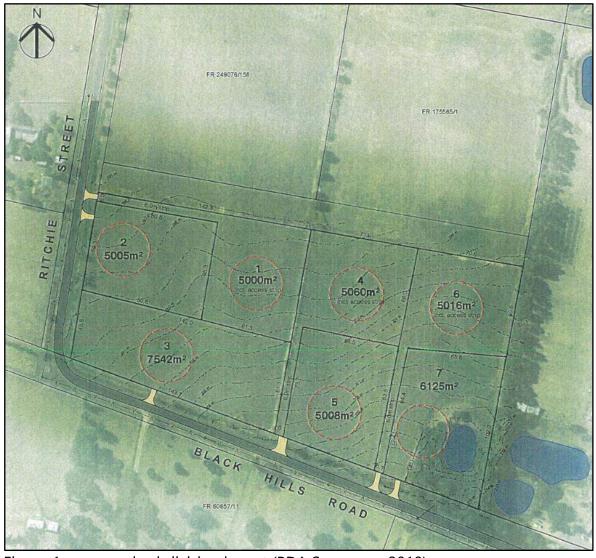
proposed subdivision layout (PDA Surveyors, 2019)
